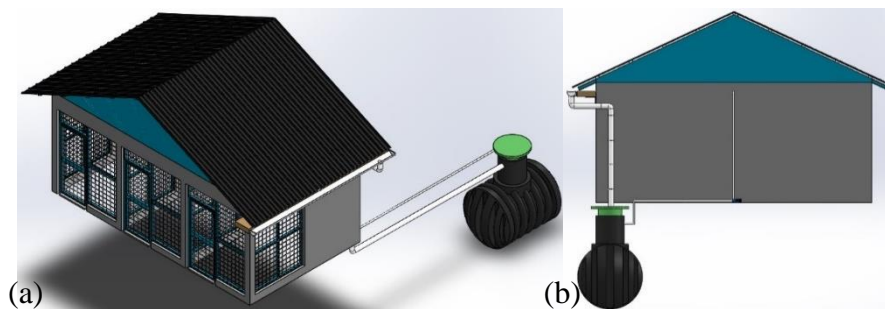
(a) Isometric View and (b) Rear View of a Building after Implementing the Indirect Pumped System.
